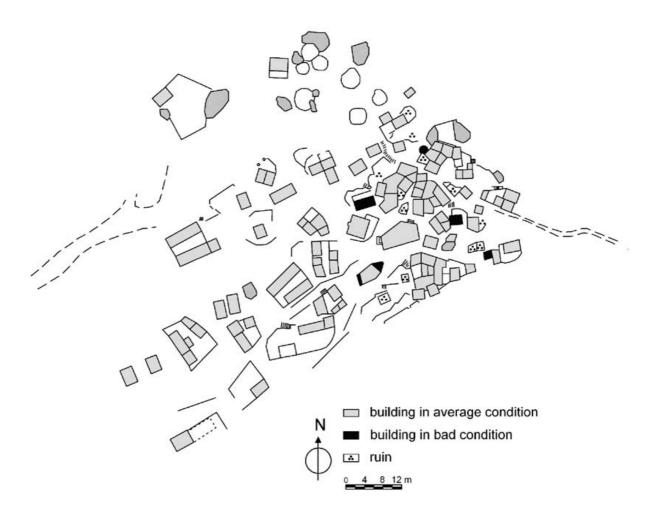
Plan showing the building conditions of the central housing area of Maqta, Oman.
